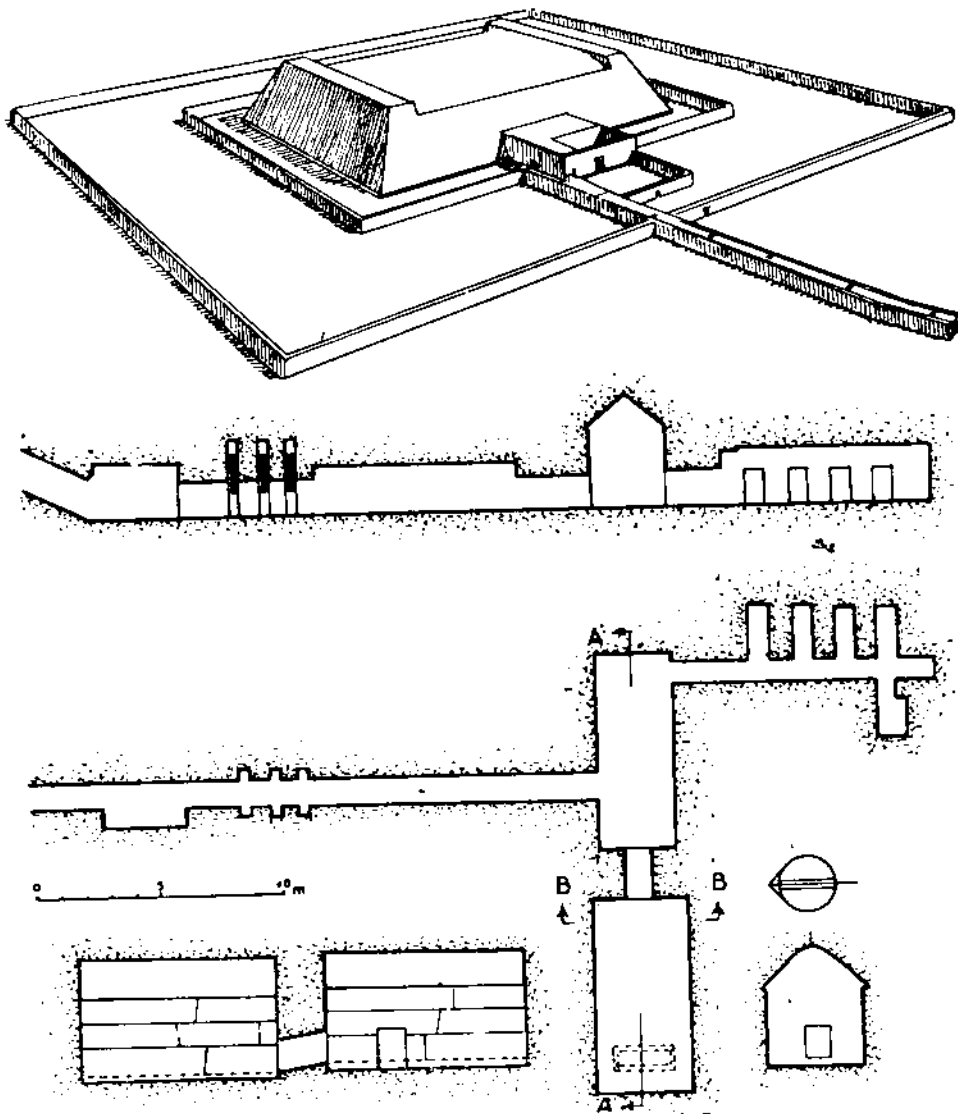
Plan and section of the burial apartments in the tomb of Shepseskaf and restored bird's eye-view of the superstructure.
